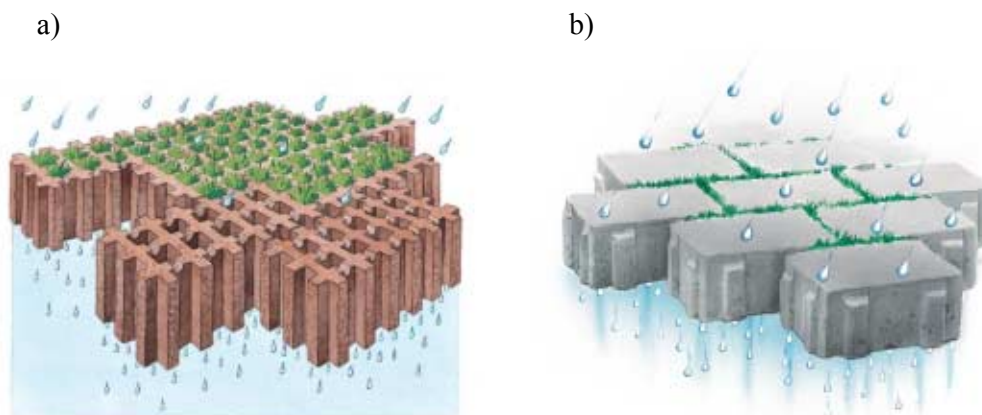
systems of permeable pavements, a) pavers with canals and b) porous pavers
